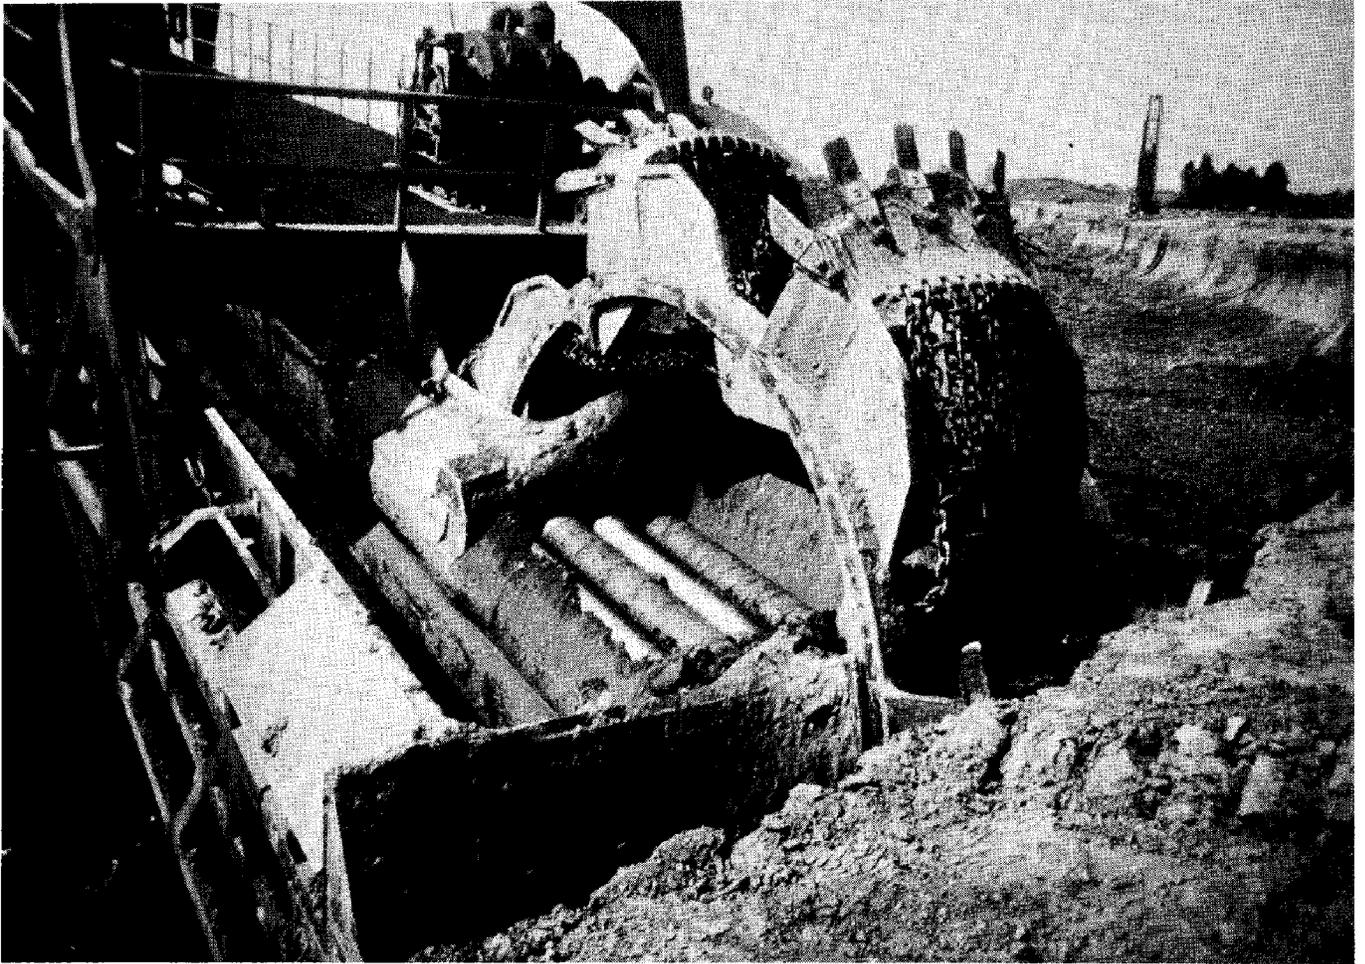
Bucket Wheel, Showing Chain-Mat Backing in Buckets and Rollers for Transfer of Material From Wheel to Belt.
